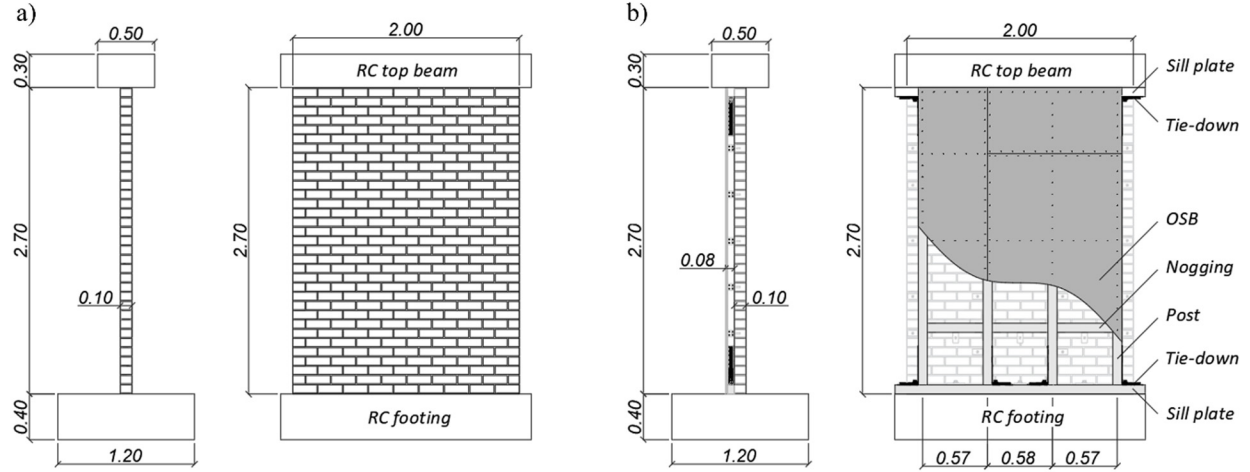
Geometry and details of the tested masonry piers: (a) bare and (b) retrofitted configurations ([4],[13]).
